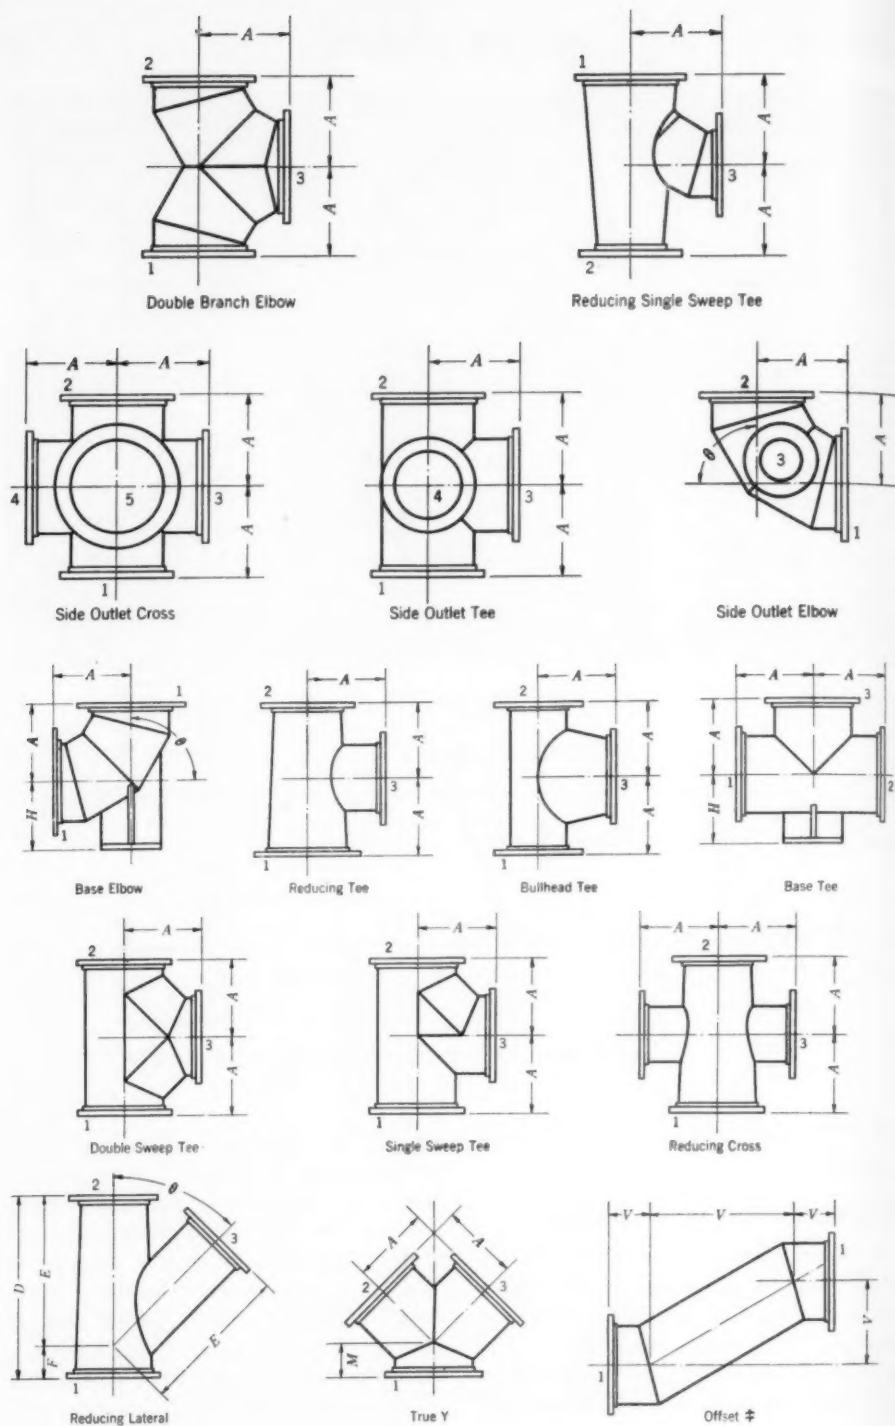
Welded Fittings for Flanged-Joint or Welded-Joint Pipe
